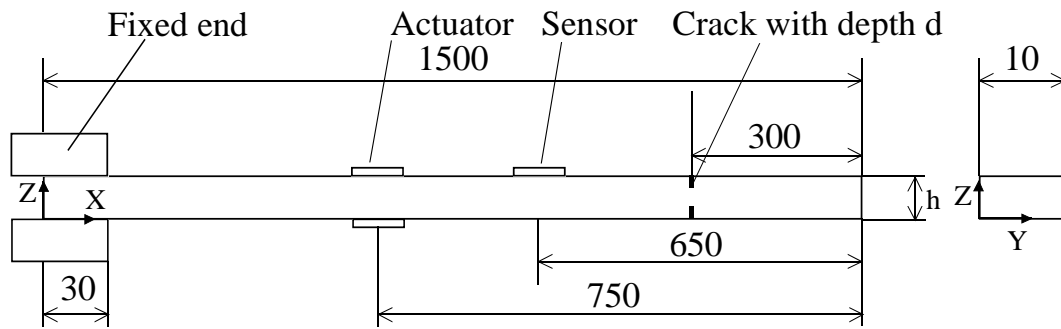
Schematic view of aluminum beams with cracks (length unit: mm).
